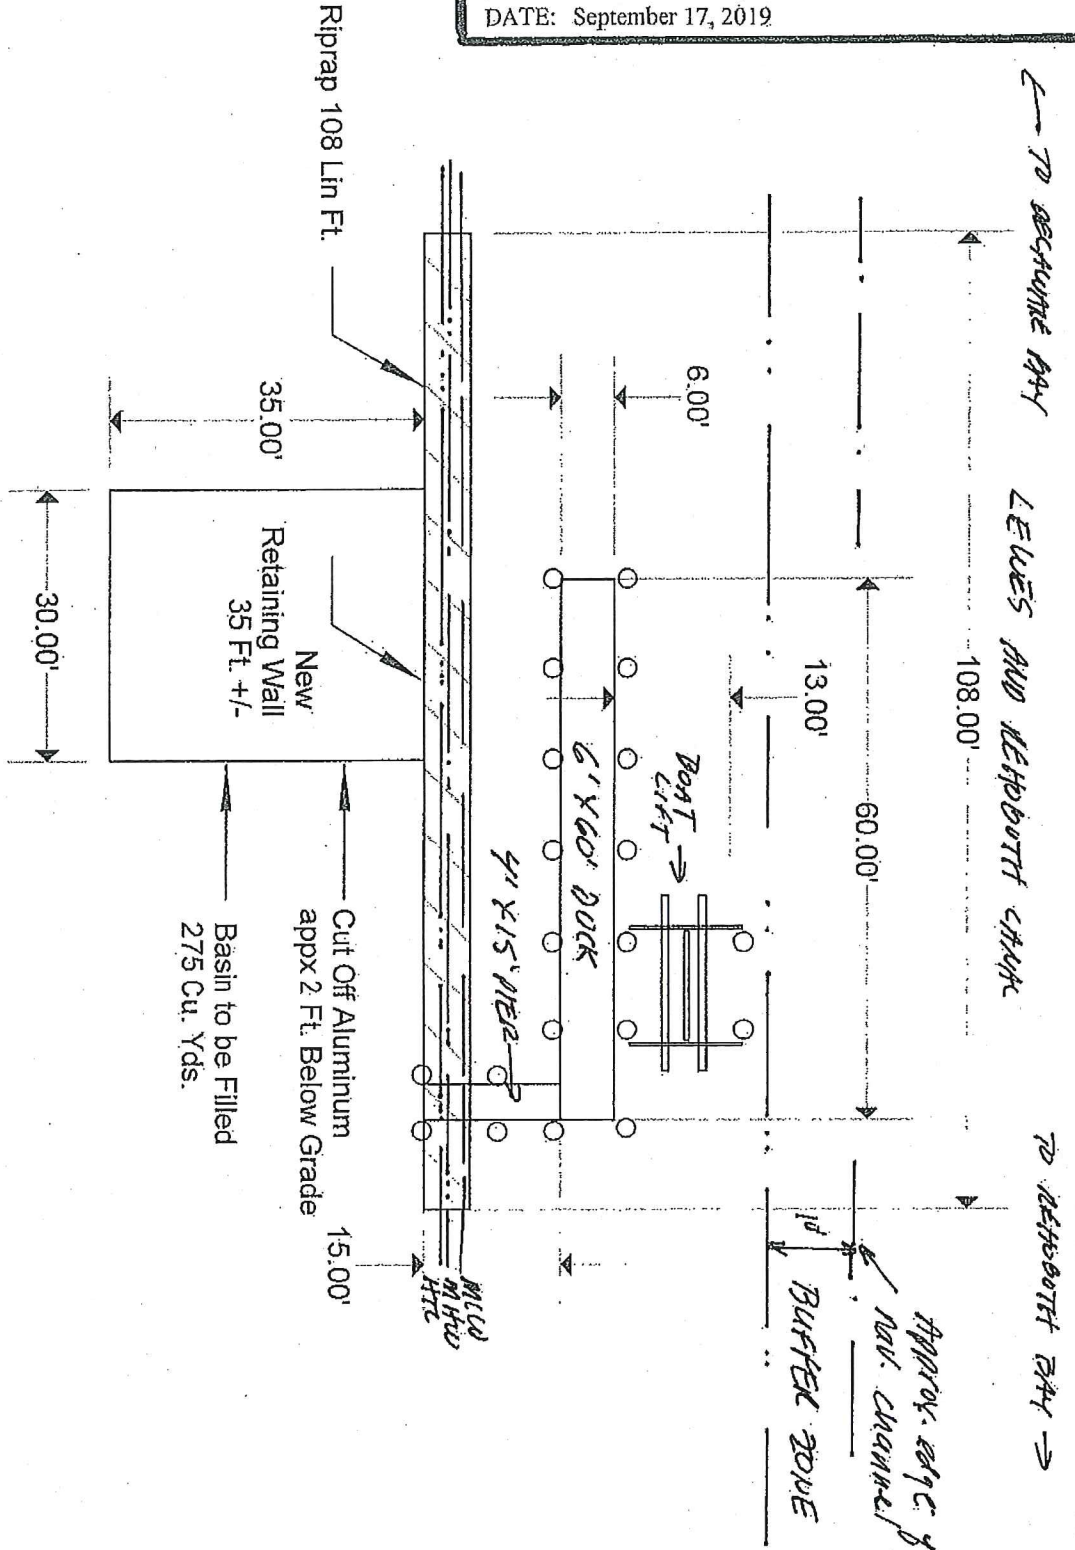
Plan view of proposed project (prepared by Precision Marine Construction, Inc.).
